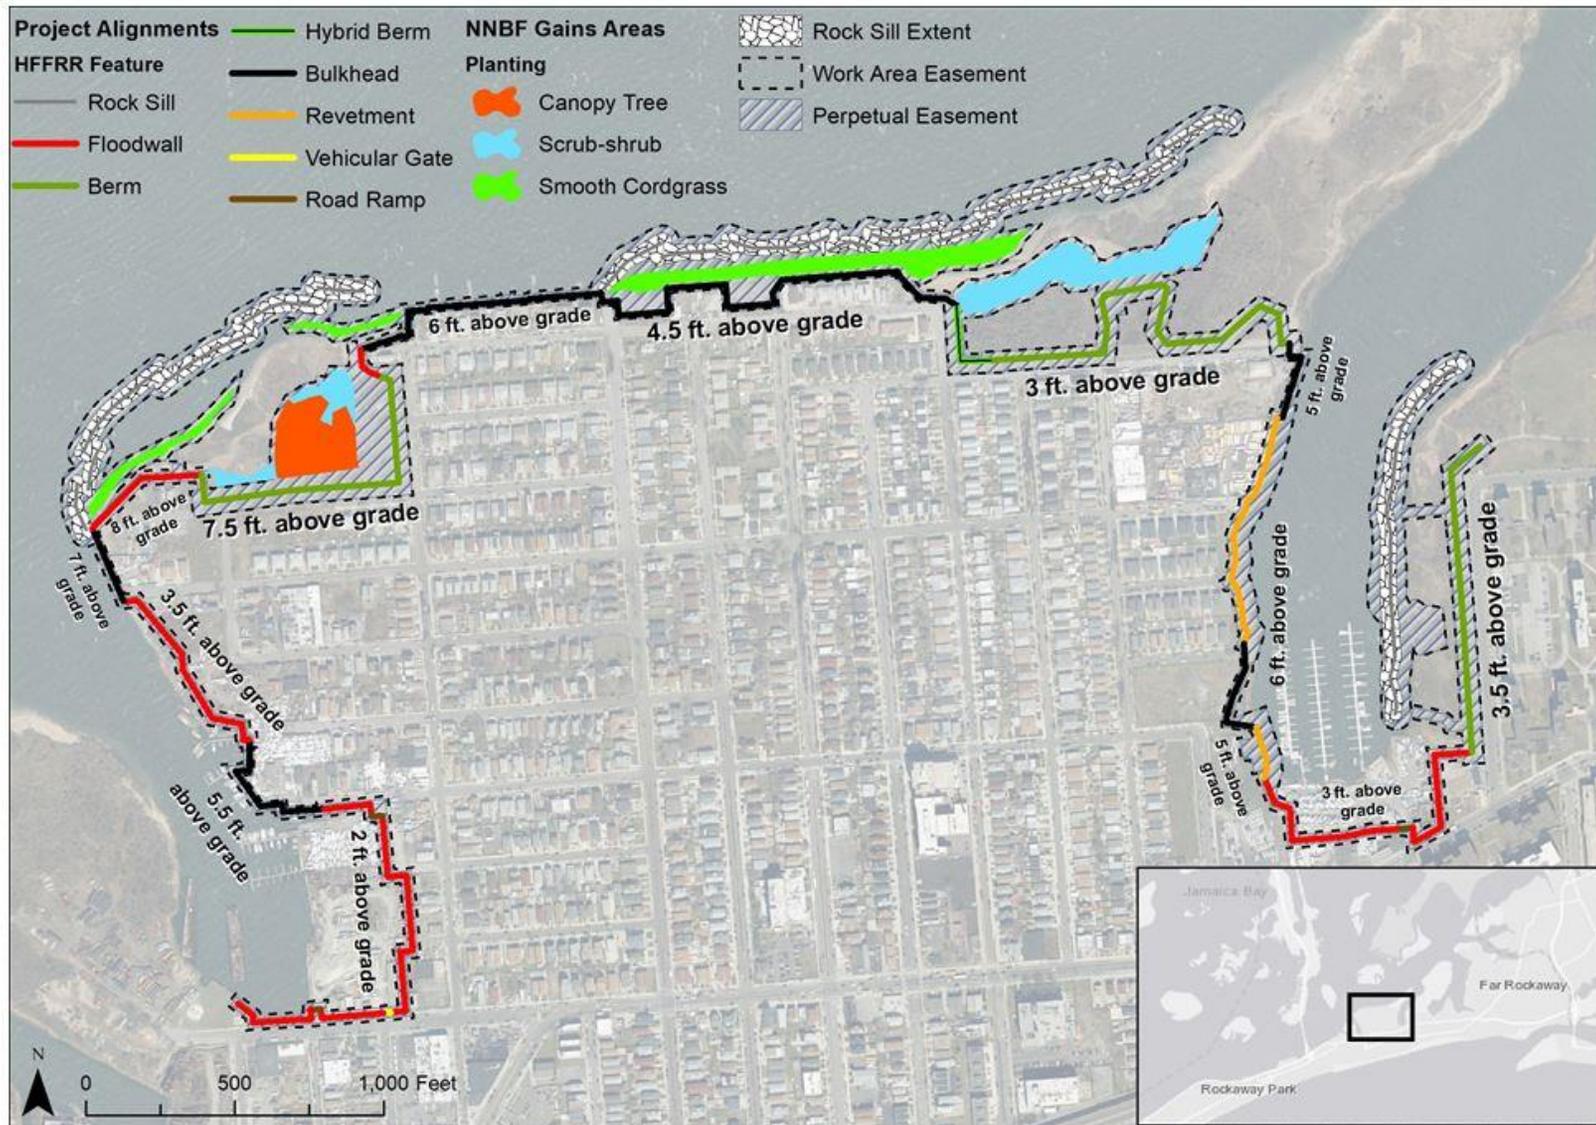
Mid Rockaway – Avene Area HFFRRF Project Plan
